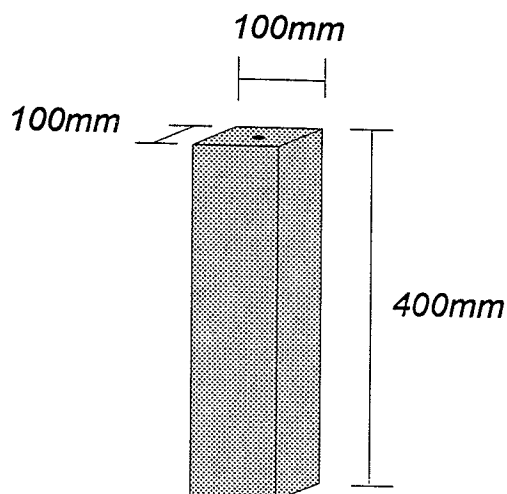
SYLVAC: measuring points and dimensions of the test specimens.
